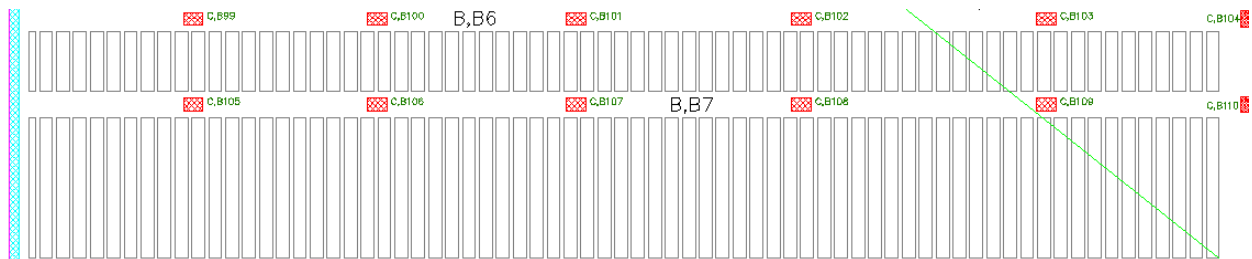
location of Beam (B, B7) in slab drawing plan.
